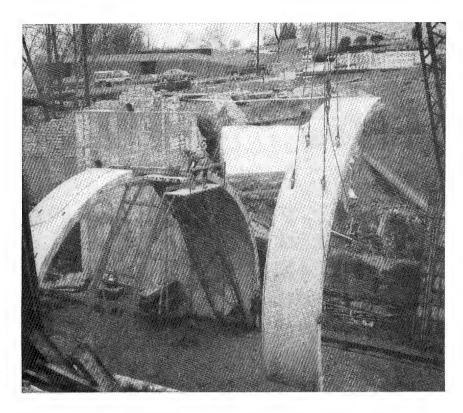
Precast arch sections being installed at Wears Creek (from Hurd 1990)
